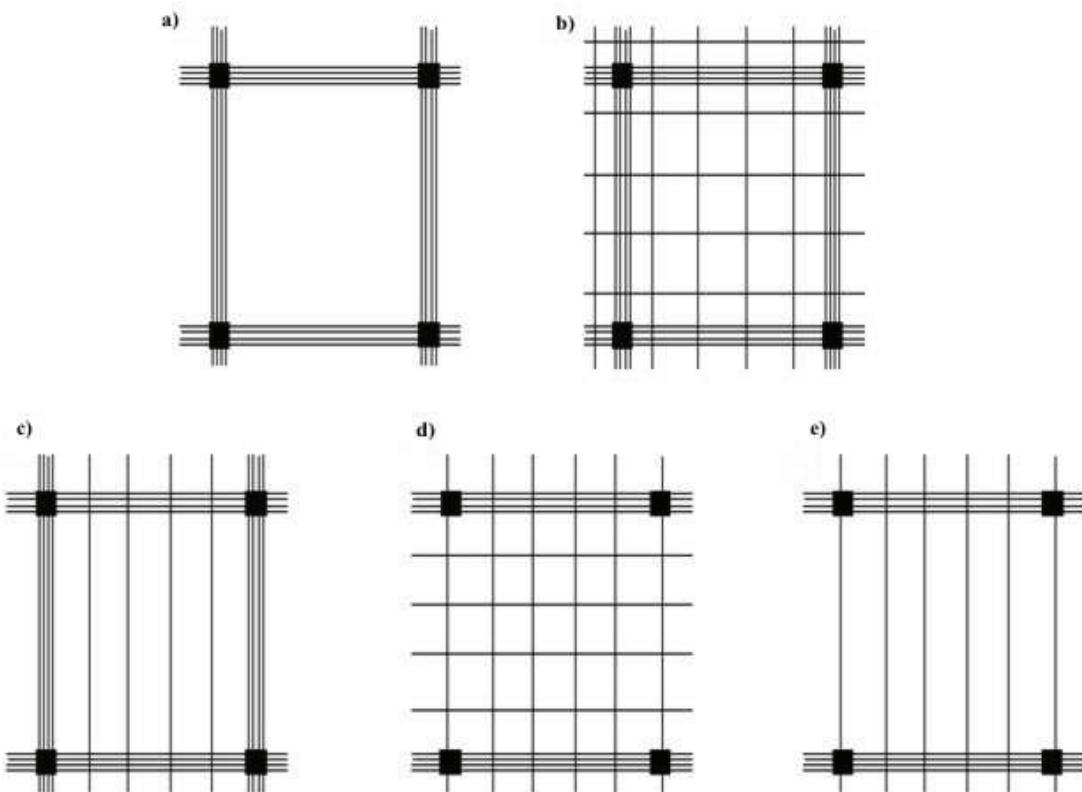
Typical patterns of tendons arrangement (ceiling plan view), for regular grid of columns
